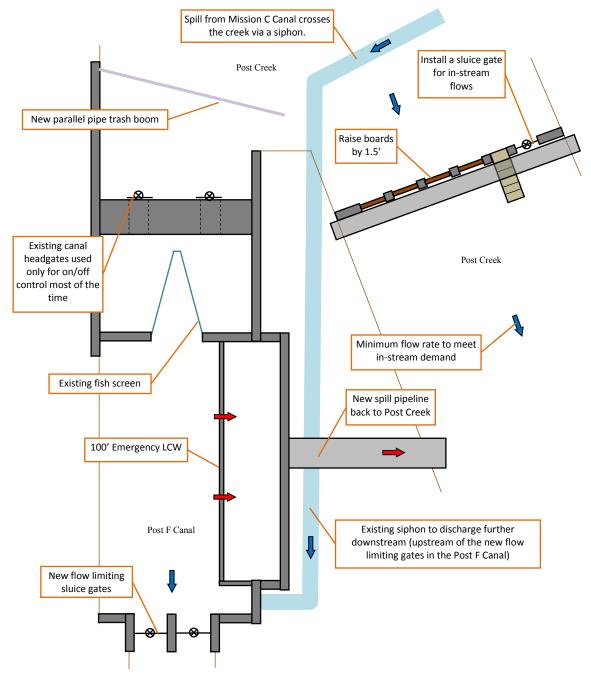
Conceptual plan view of new control structures at Post F Canal and Post Creek bifurcation (not to scale)
